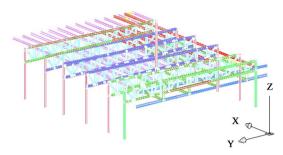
3D rendering of steel structure construction of food transport building 图 1. 钢结构施工 3D 效果图
